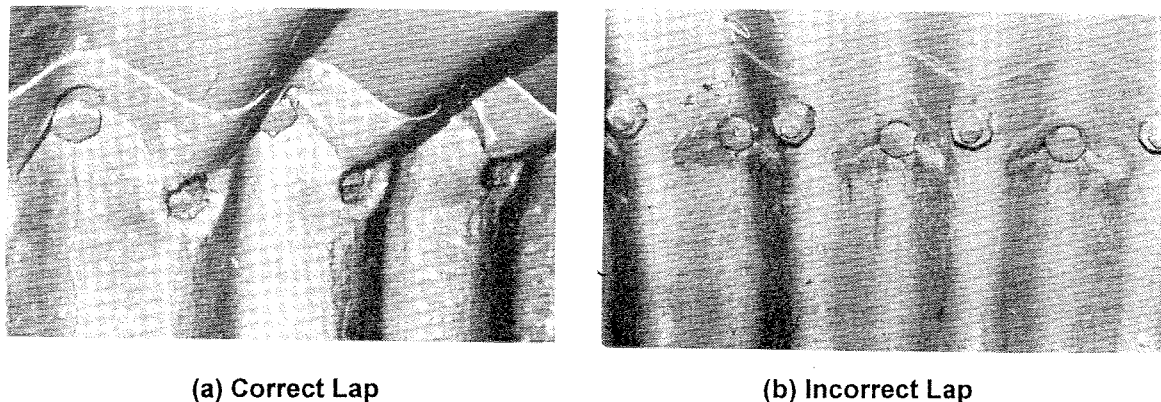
Observed Joint Cracks in the Corrugated Steel Structures
